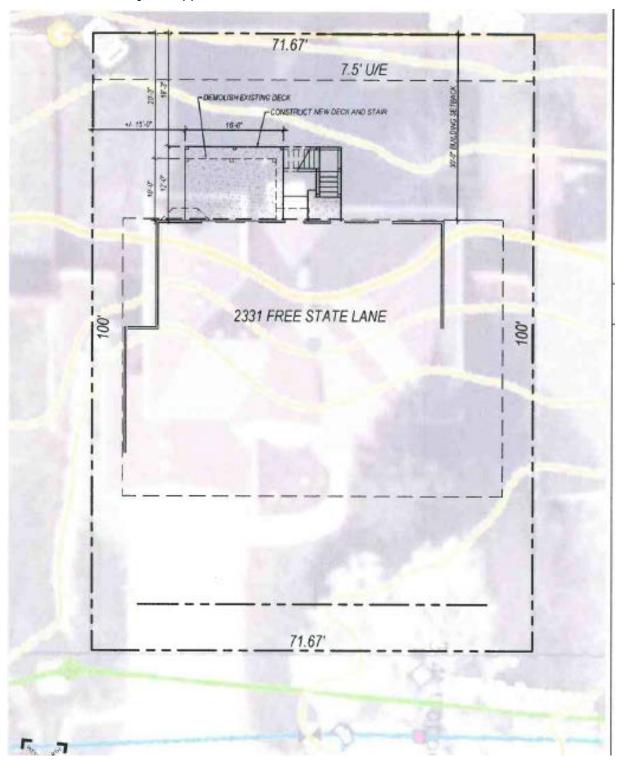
Applicant's site plan of Proposed Addition (deck) and existing residence. Proposed deck will extend an additional two feet into the rear yard.
